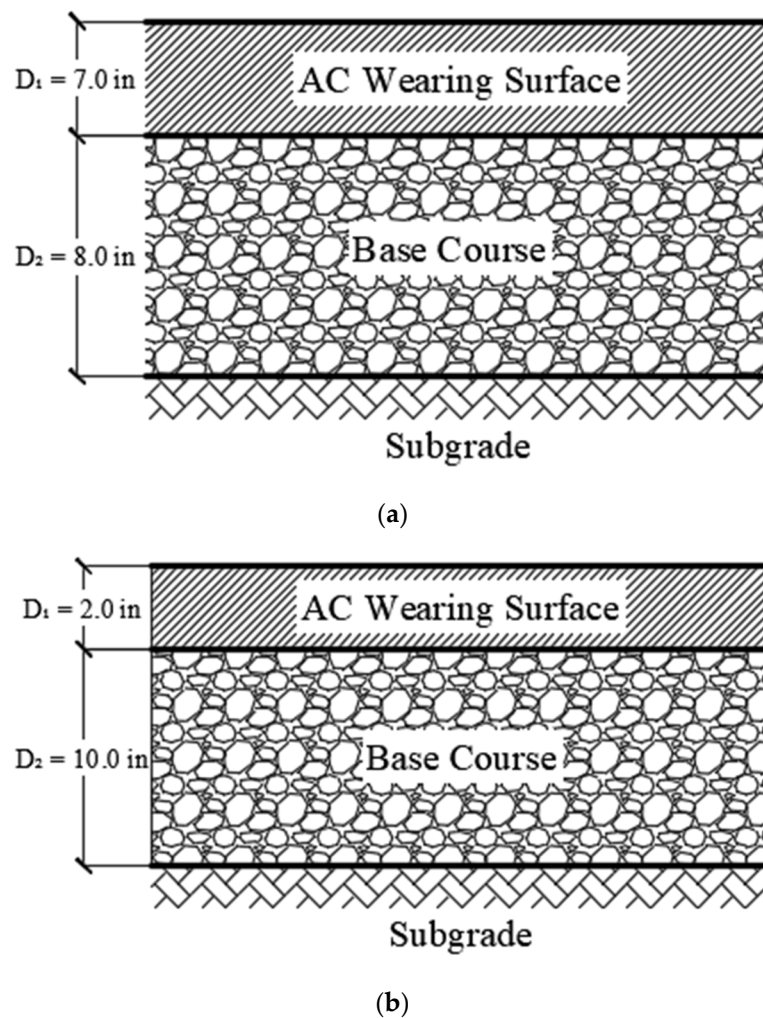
Pavement Design Sections: (a) the 1993 AASHTO design section and (b) the suggested pavement structure using ME-PAVE (N.B. 1-in = 2.54 cm).
